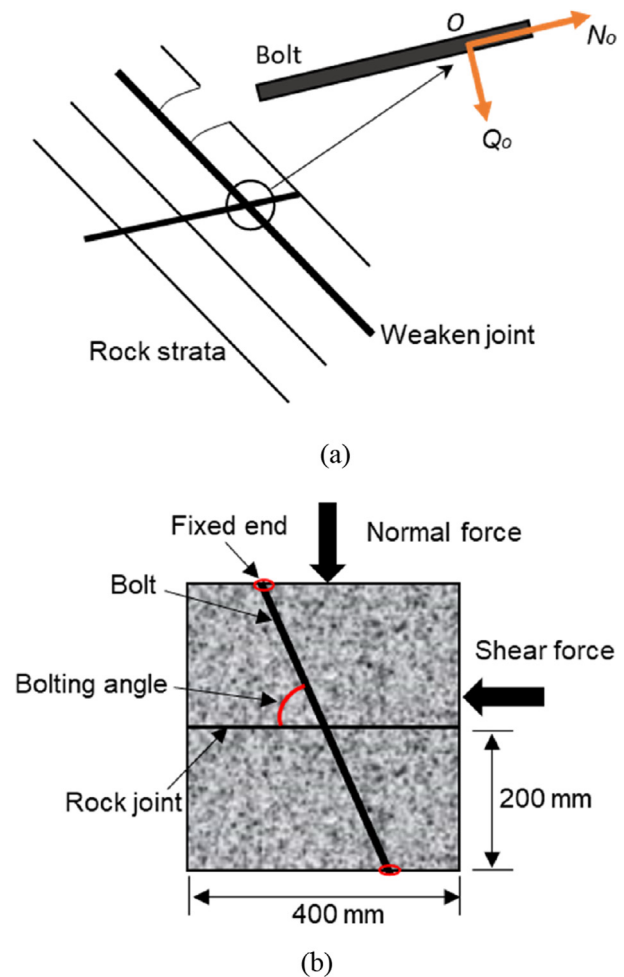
Testing model: (a) a bolting case in bedding rock mass. (b) Schematic diagram of shear test for the bolted rock joint.
